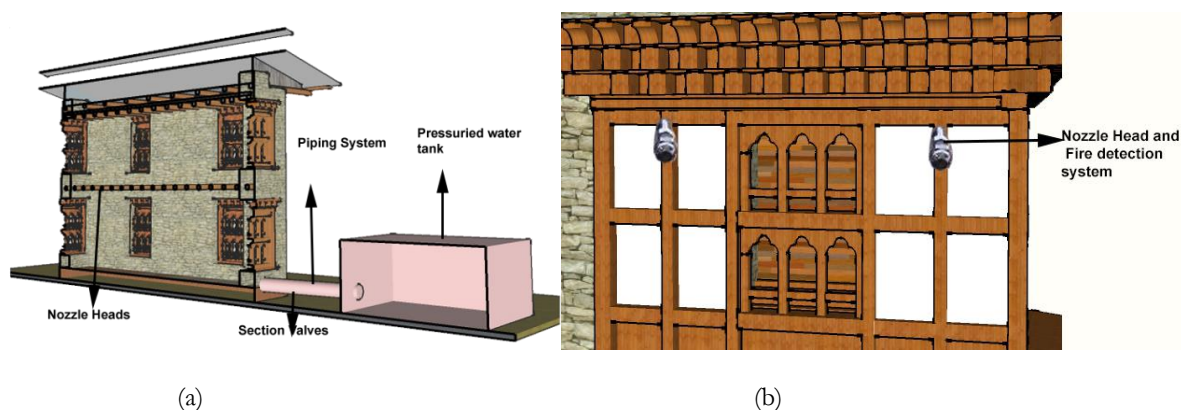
(a)Section showing water mist fire suppression system in traditional Ap Sangay's house. (b)Fire protection of facade of building. Illustration source authors
